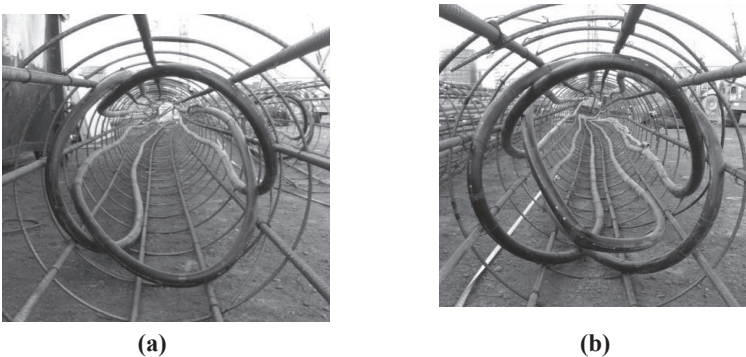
Heat exchanger tubing attached to reinforcing cages: (a) Foundation A, (b) Foundation B
